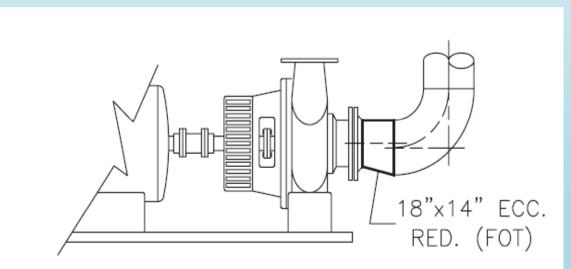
Eccentric reducer on pump suction nozzle.
